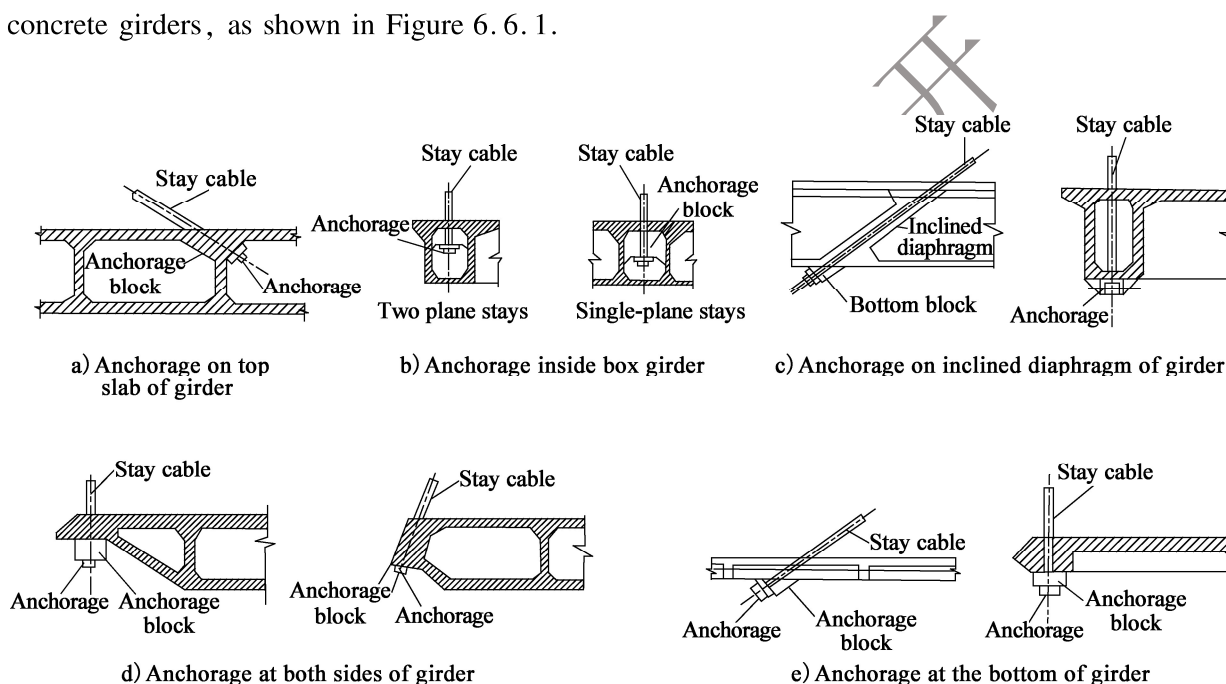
Fundamental types of anchorage of stay cable in concrete girder
